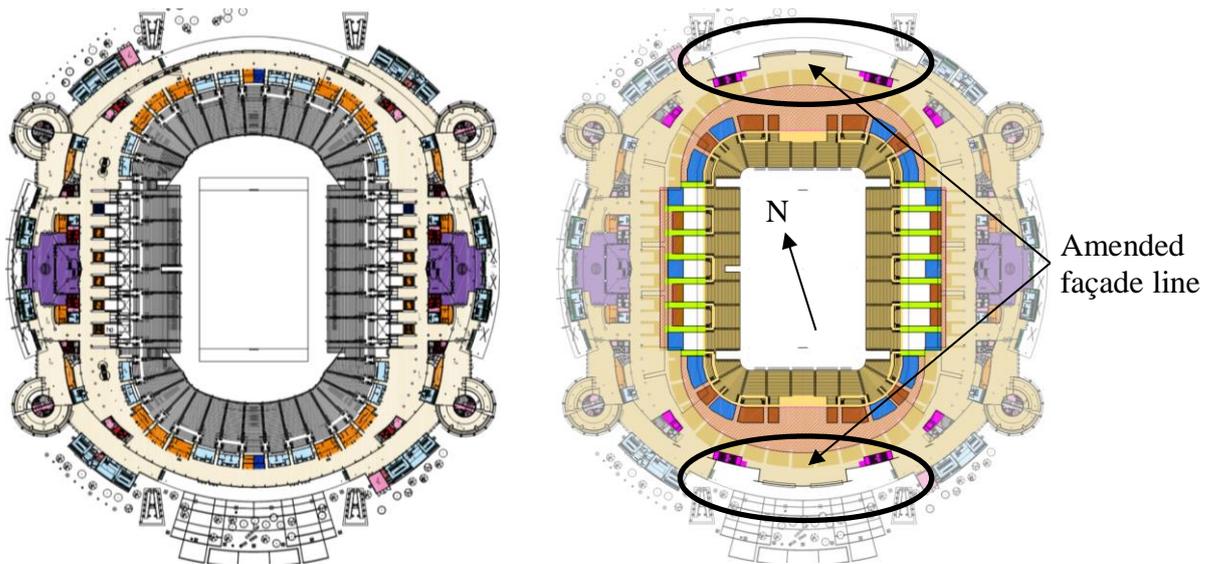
Ground floor plan view of existing (L) and proposed design (R)
